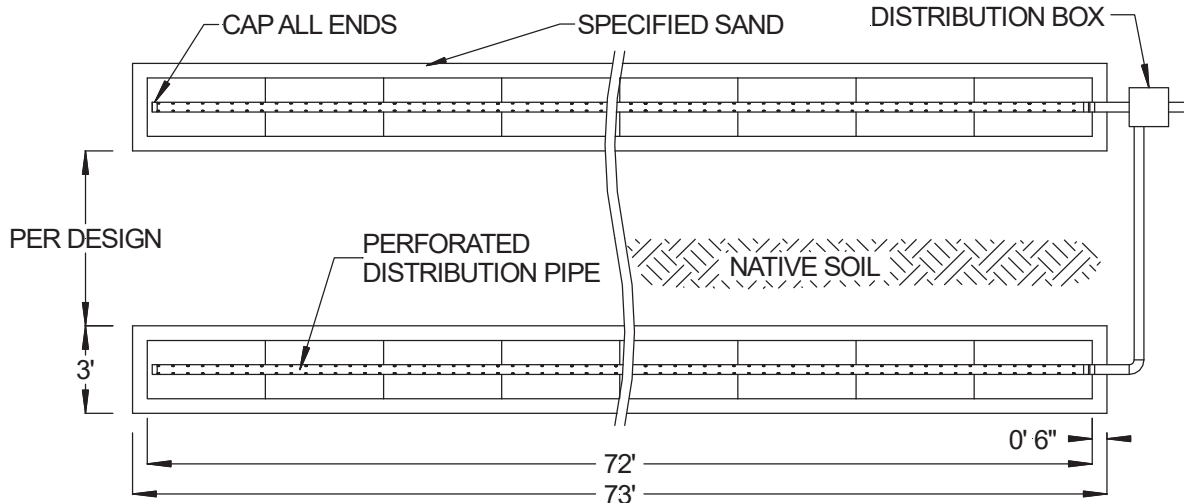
SECTION VIEW – TRENCH SYSTEM EXAMPLE – LEVEL SITE
